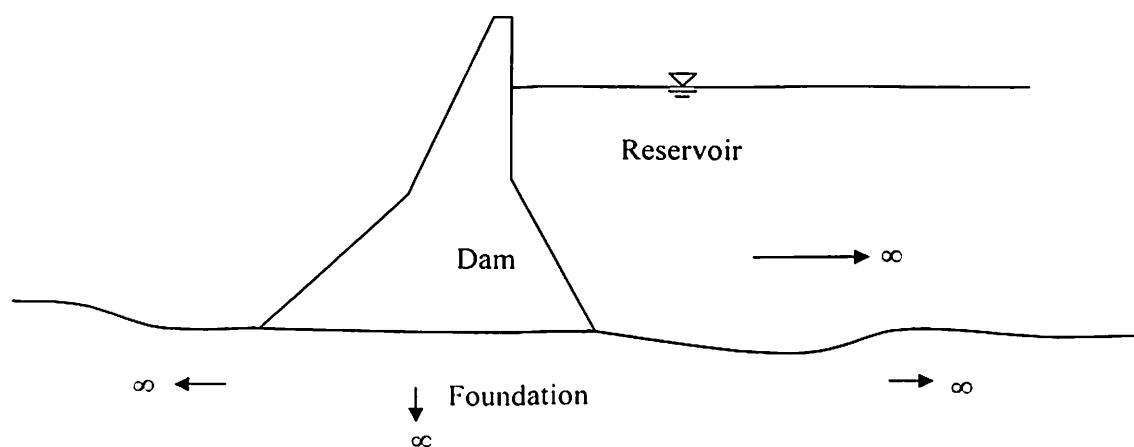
A Typical Dam-Reservoir-Foundation System
